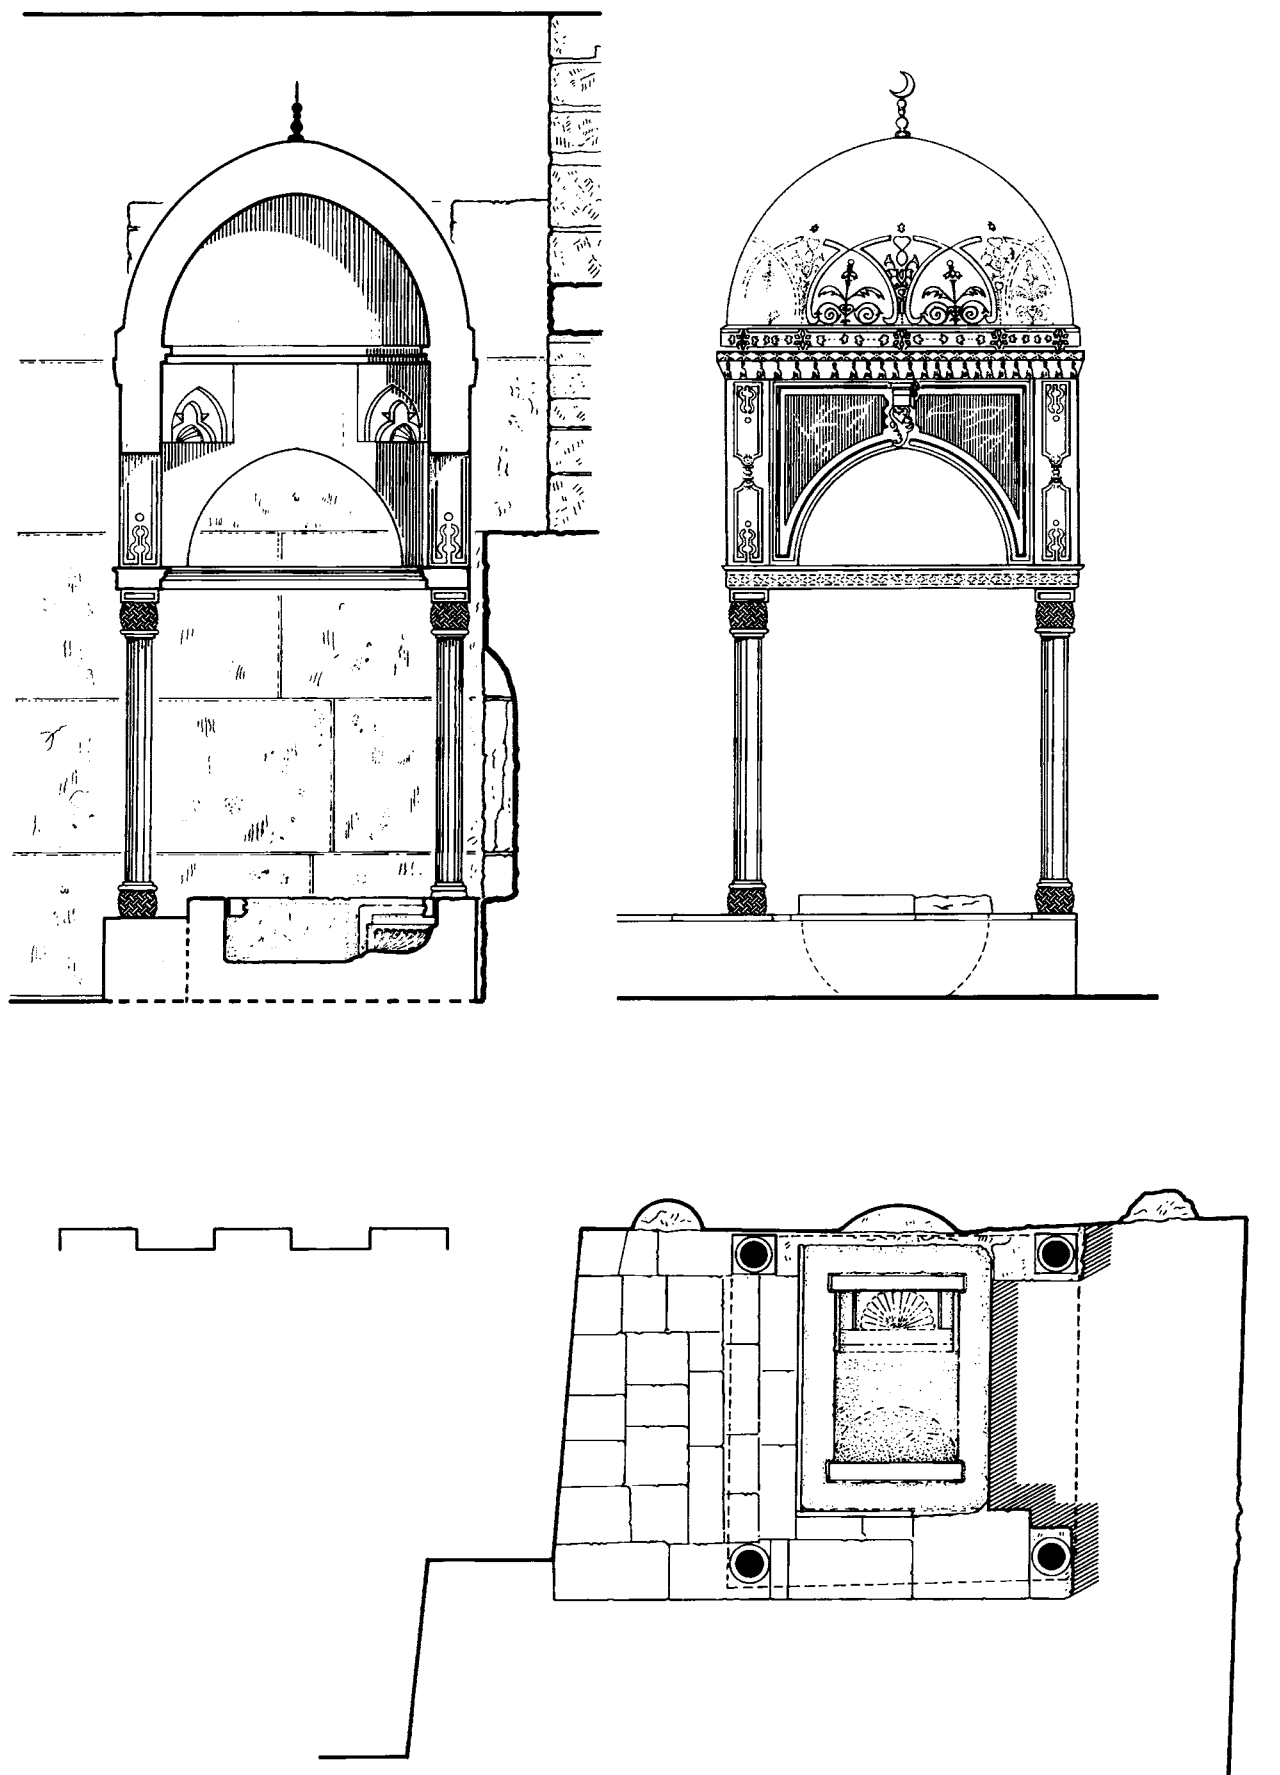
Qubbat Mahd 'Isa: section, elevation and ground plan.
